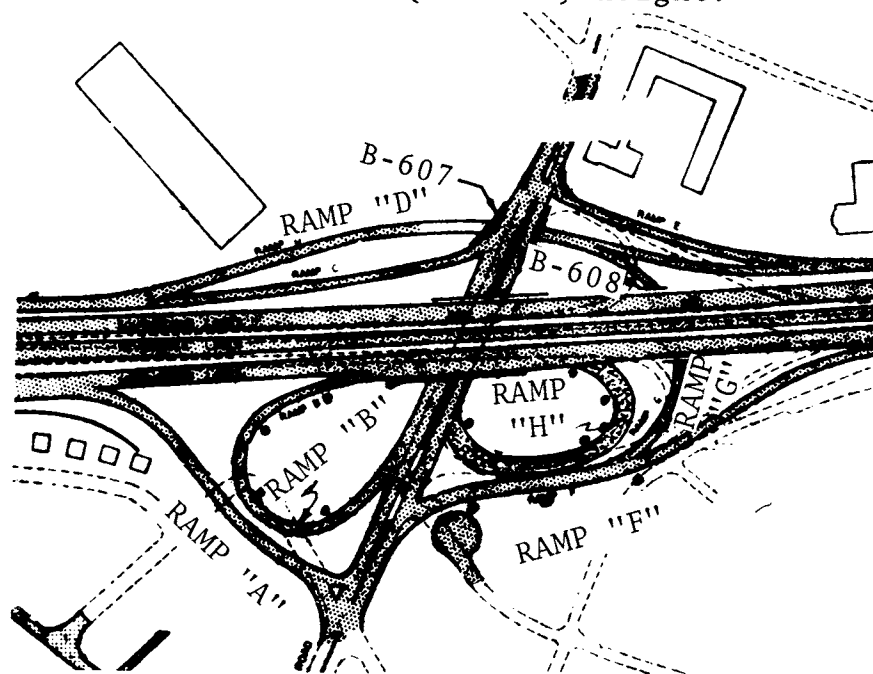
Plan view of the Glebe Road interchange. General luminaire locations on Ramps A, B, H, and F are indicated.
